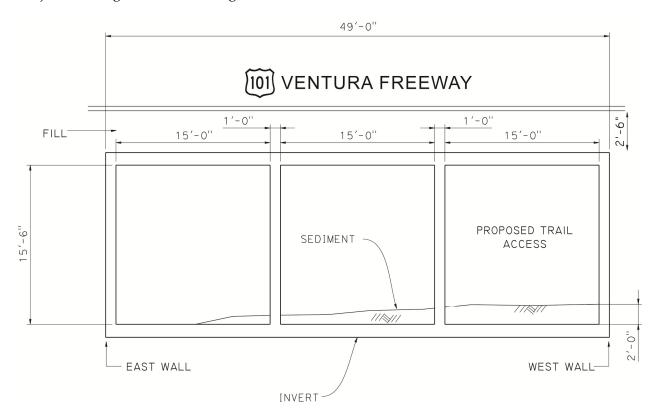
US 101 Underground Culvert (3 Cells) Cross Section
